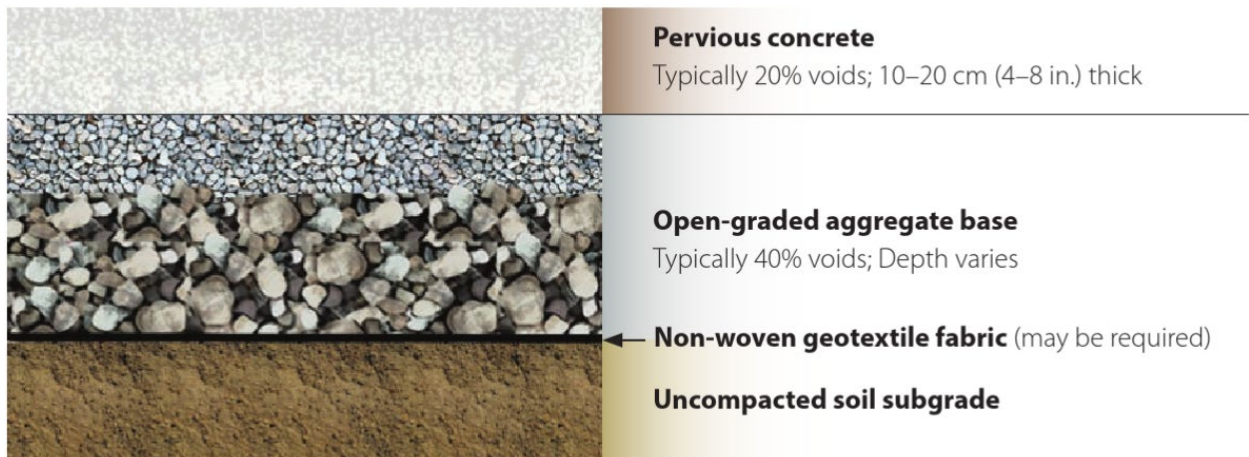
Typical pervious concrete pavement system section (B. Eisenberg et al. 2015).
